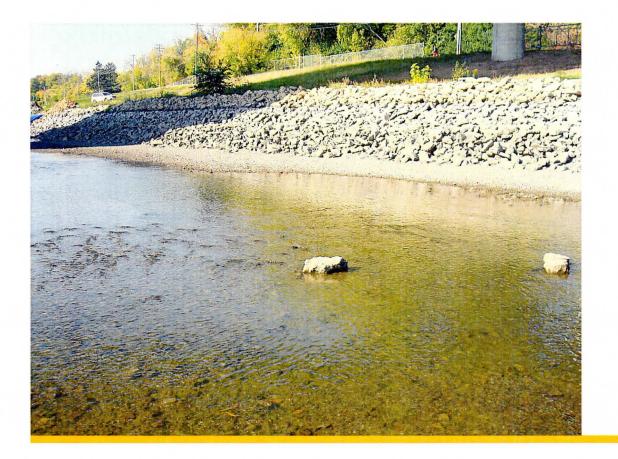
Date of Photo: 10/11/2011 Description: Dewatered canal inspection adjacent to former Appleton MGP site View Direction: W towards Site
